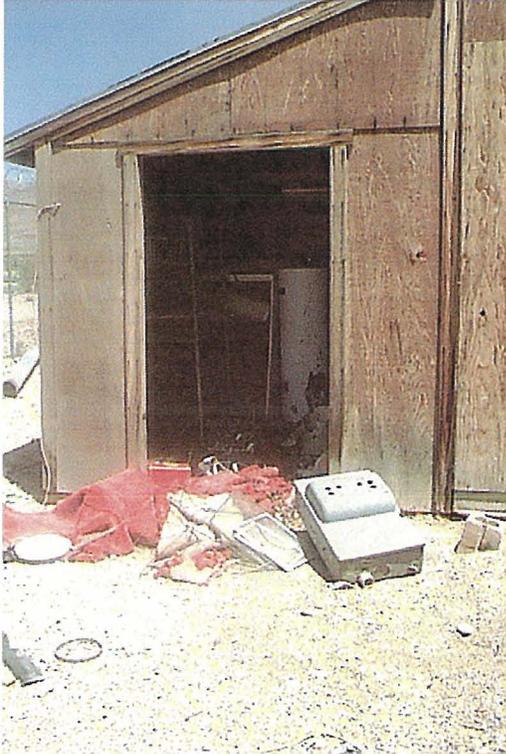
Taken by E. Seum on 5/13/99. Shows northwest end of above building on the Advance #4 mill site.
